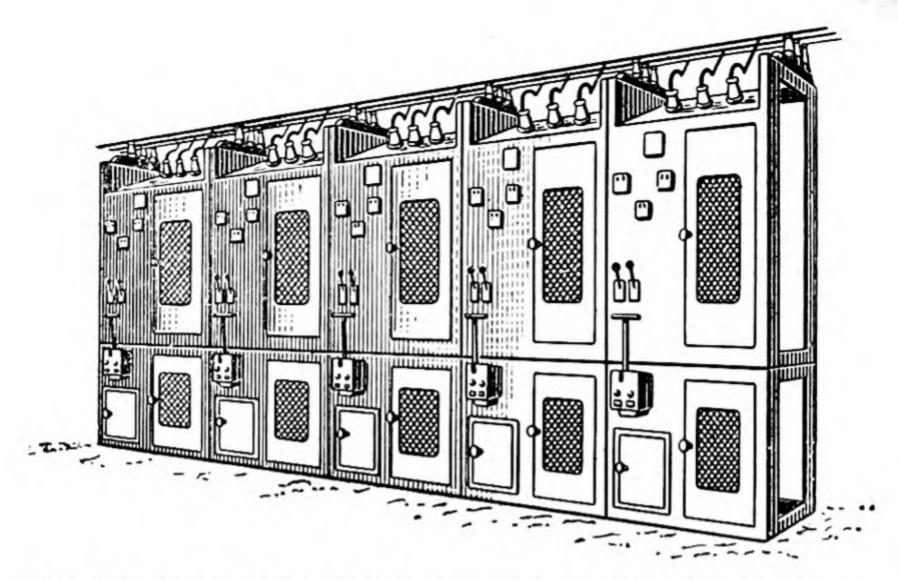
Switchgear installation assembled of KCO(KSO) compartments.
